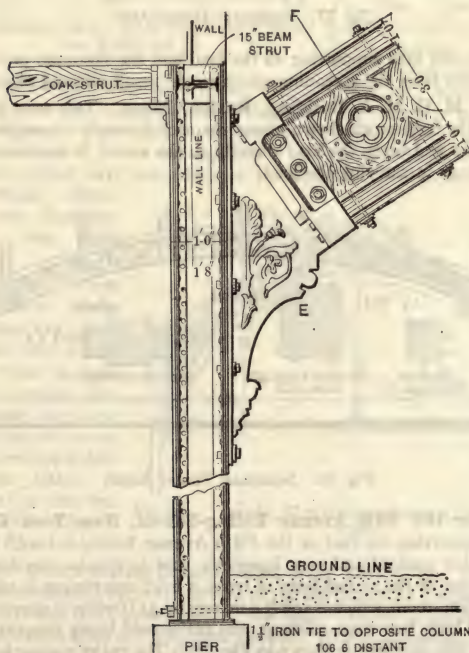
Detail of Iron Skewback and Post of Truss Shown in Fig. 38
